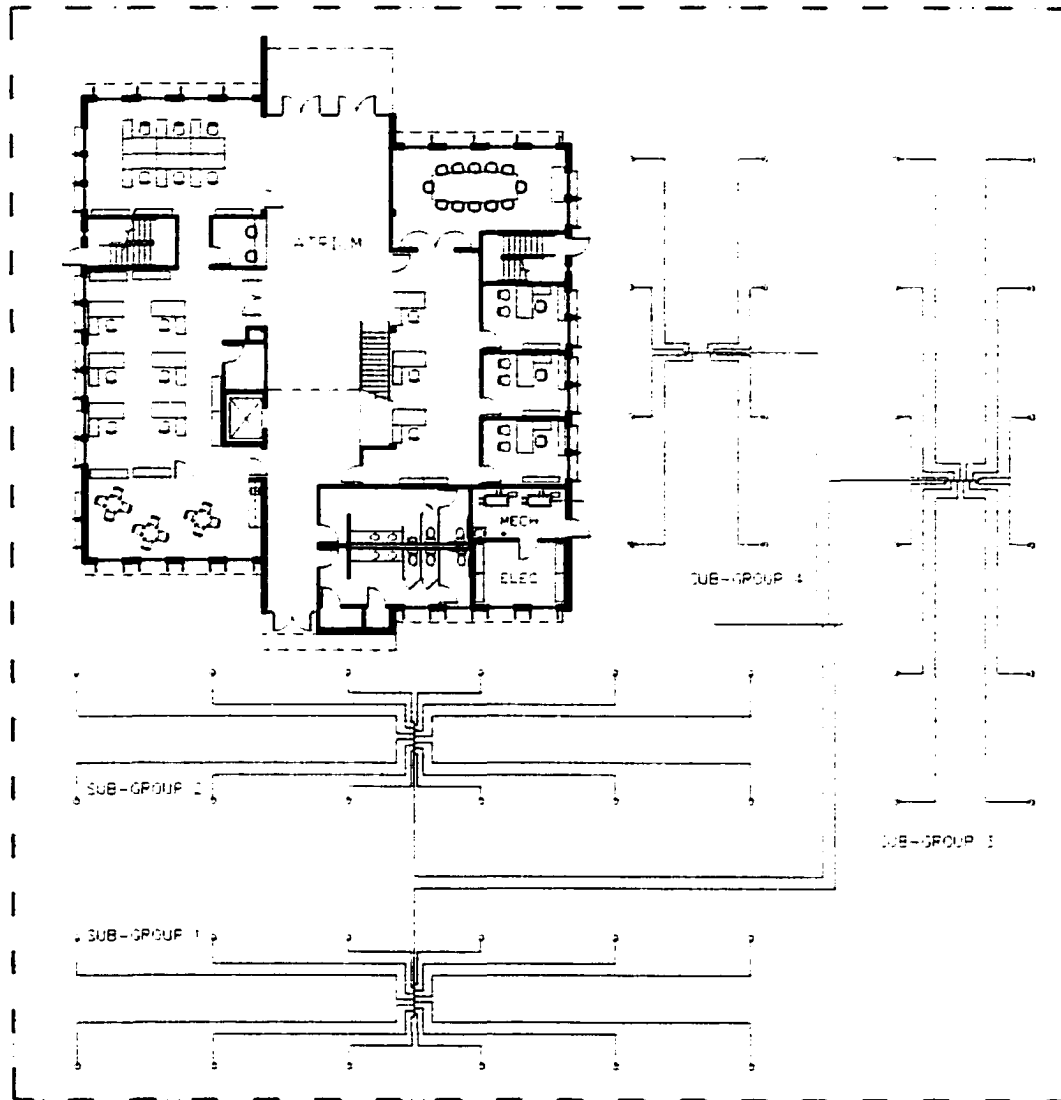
Site Plan with Level 1 Floor Plan and Borefield
